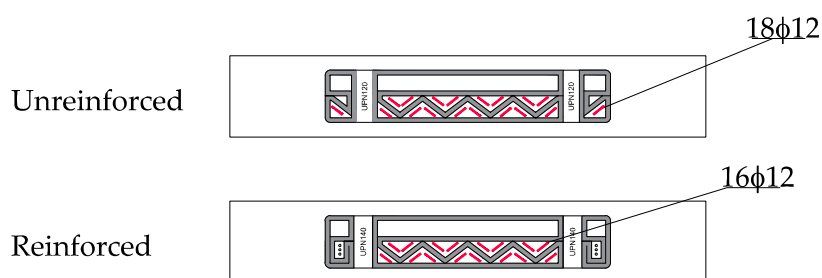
Connection of the 3D printed walls with the reinforced concrete foundations.
